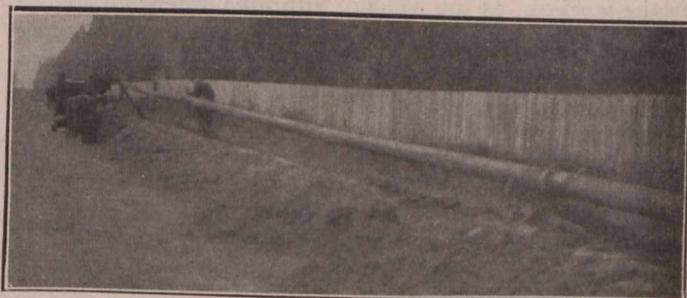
Six-inch pipe welded on trestles, then settling by its own weight into trench.
